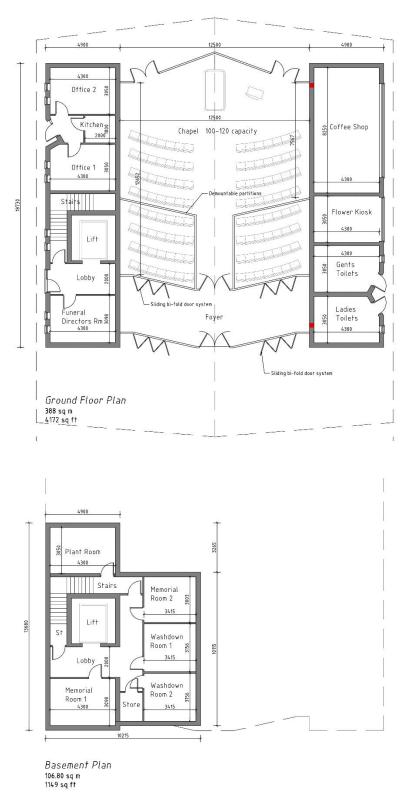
Proposed chapel floorplans ground floor & basement (Loxton Design Ltd, Dwg. No. 18/408/P08, 09/2018)
